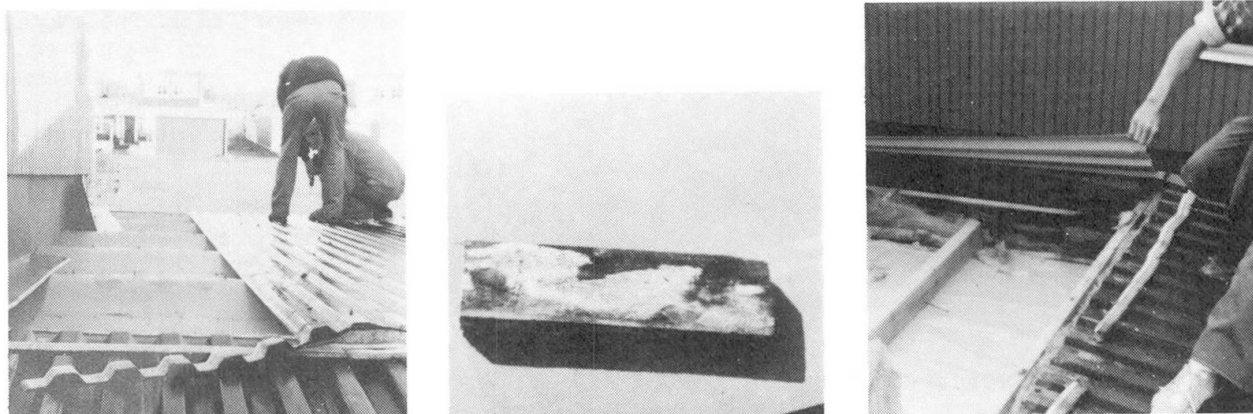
Moisture damaged flat roof with metal sheeting. Moisture penetration from both the inside and the outside. The fibre board hung down, thus blocking the vented air space. The moisture content in the construction increased and caused mould and rot damage. (Example 1.)
